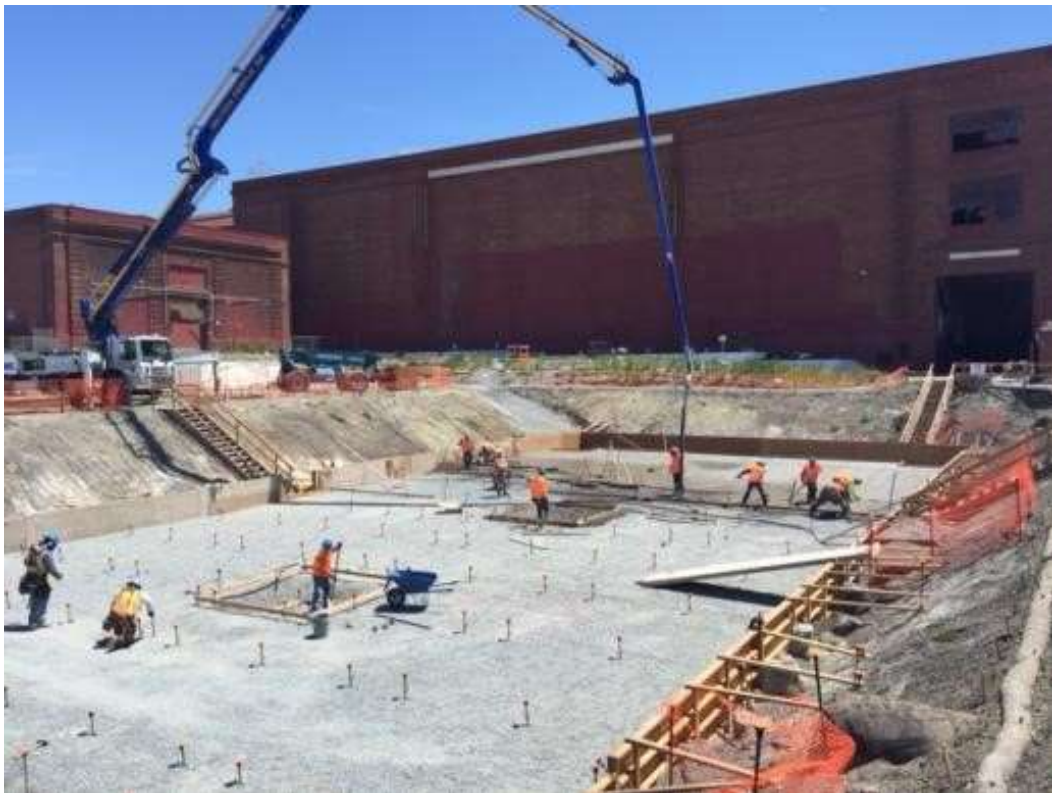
Pouring concrete for GIS building foundation at Potrero Switchyard. View northeast, June 30, 2015. Photo courtesy of PG&E.
